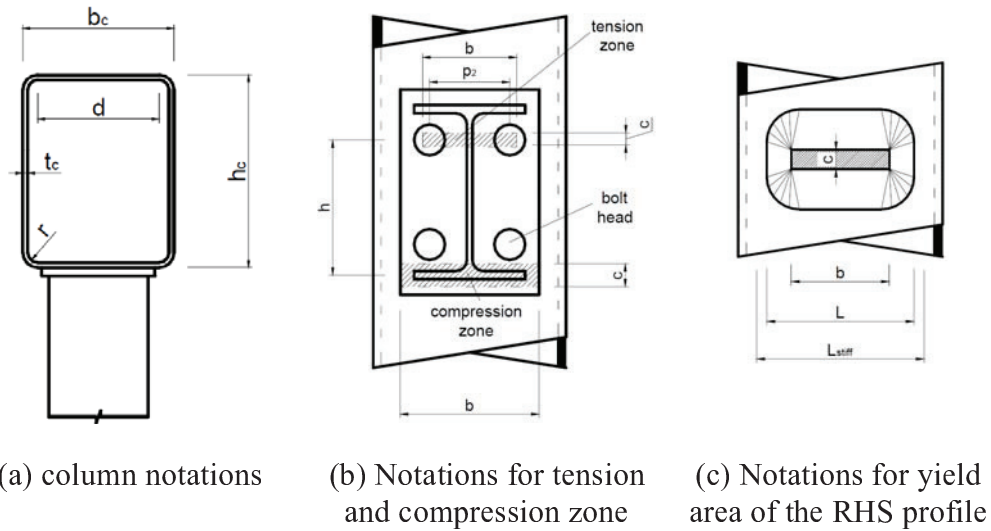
I-beam-to-RHS column joint with flush endplate [13]
